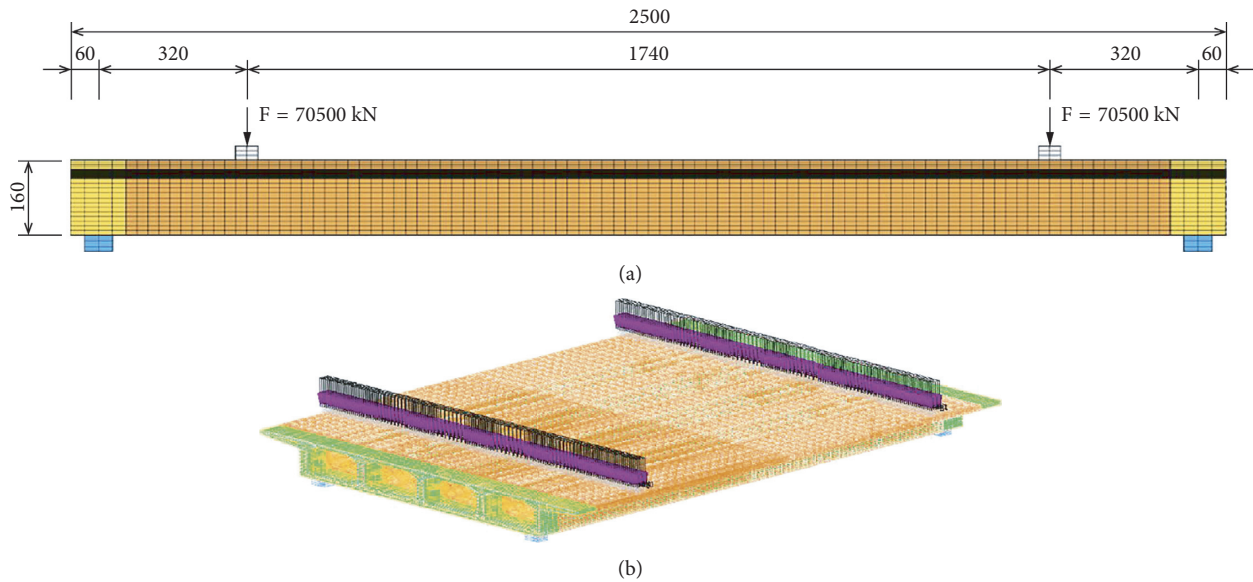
Model of the box girder (unit: cm). (a) Elevation of the model. (b) Finite element of steel bar.
